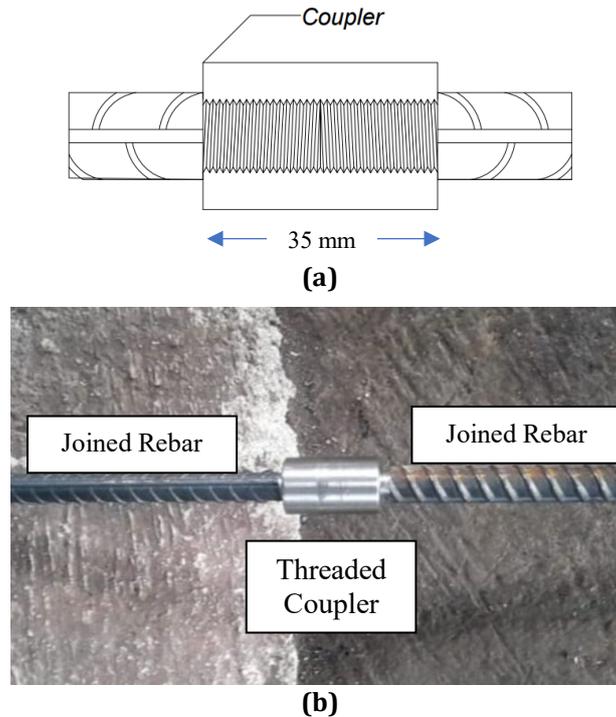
Threaded coupler mechanical splice (a) Illustration; (b) Real Setup
